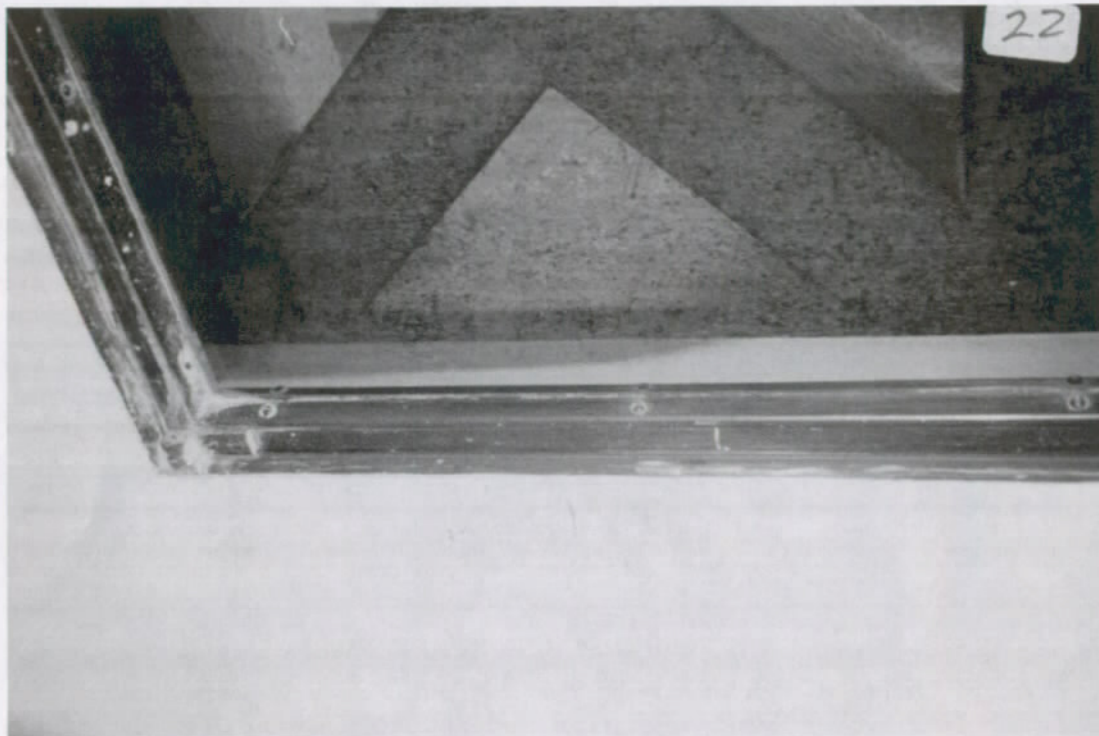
View of typical east/west wall window, showing bronze interior frame. Note sloppy paint work.
